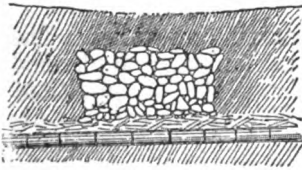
Blind inlet or drainage well sunk below the surface to permit cultivation.
